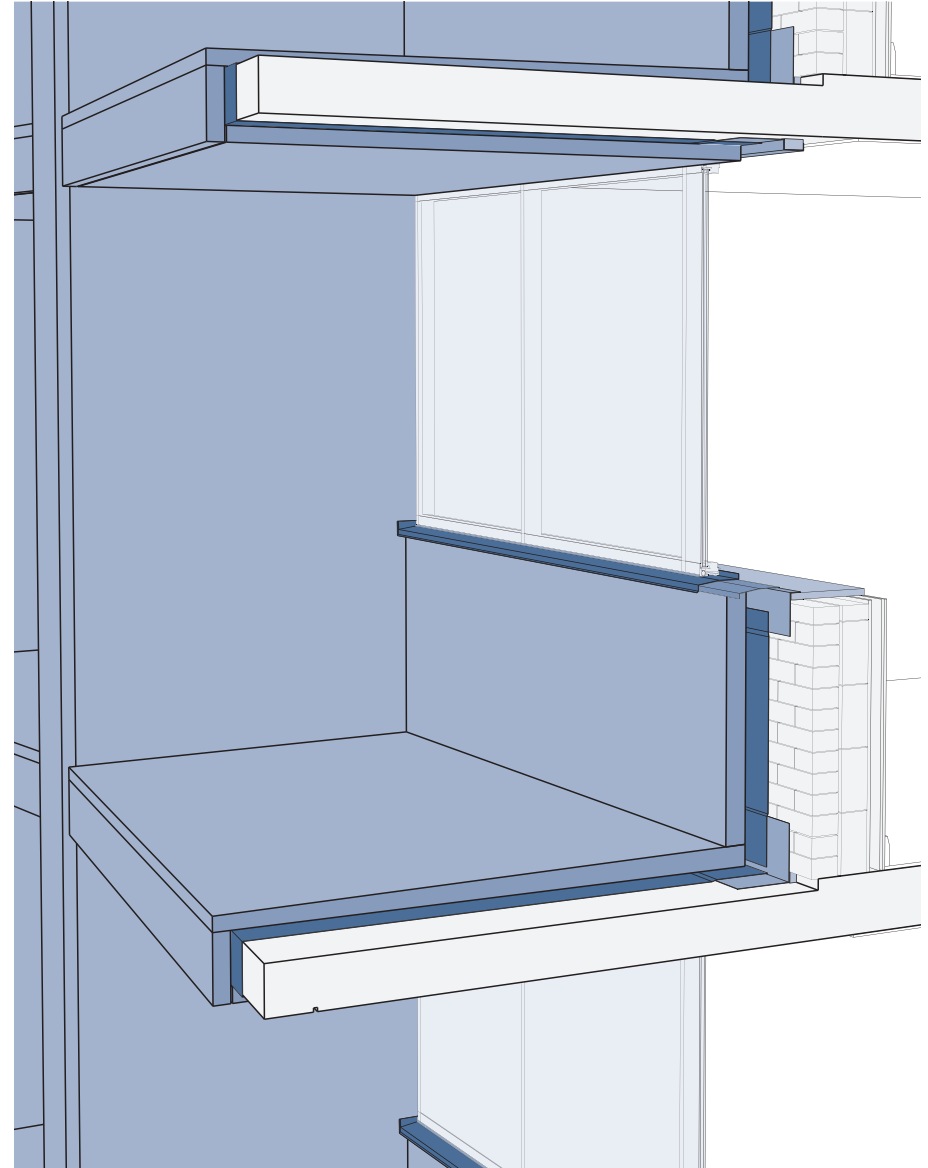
Exterior insulation is subsequently installed over the entire exposed surface areas of the balcony slab, balcony wall and shear wall.
